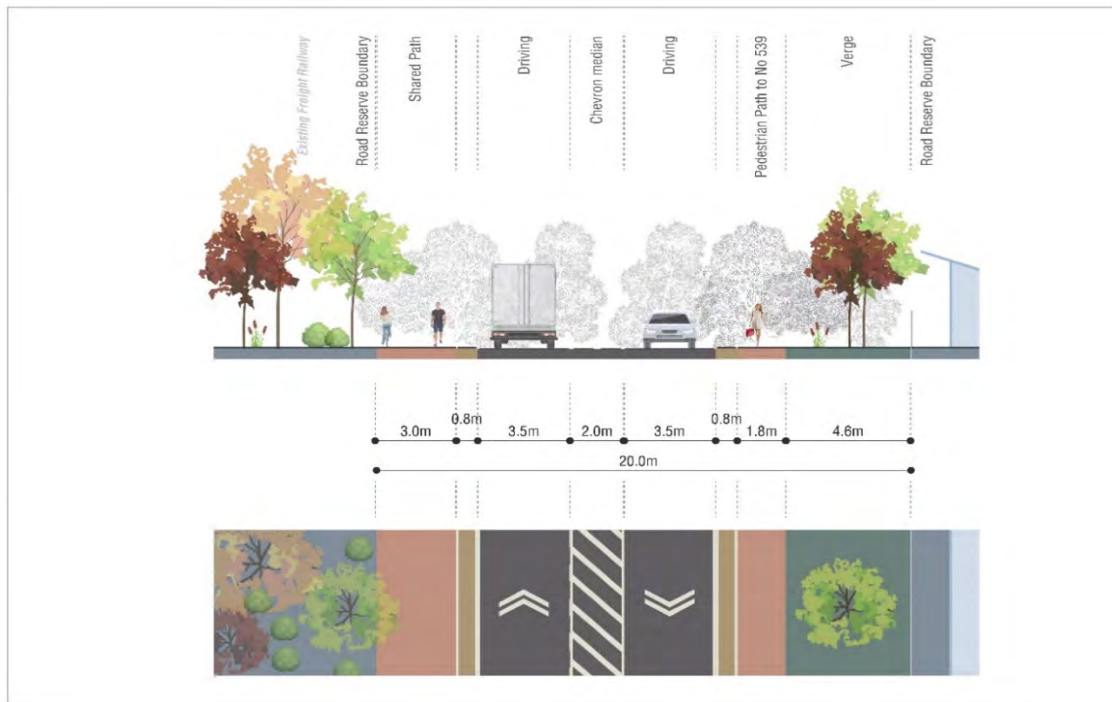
RD09 Milner Road (Berkshire Road to Sultana Road West) and RD10 Milner Road (Stewart Road to Maida Vale Road) Cross Section
